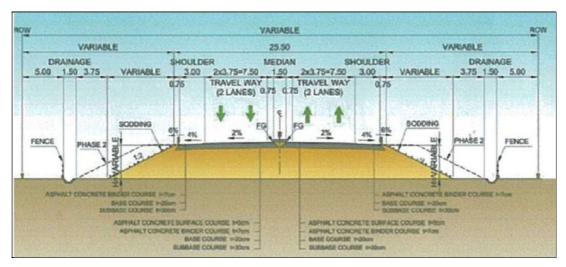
shows a typical cross section of Expressway in Vietnam is a 2 way, 2-lane road.
